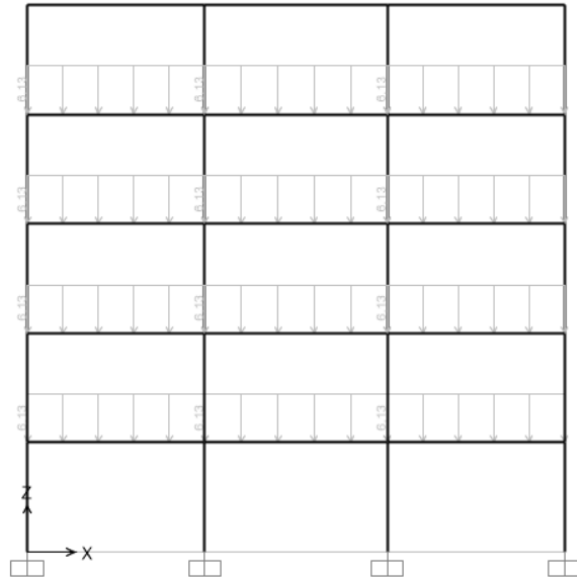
Example of distributed loads representing weight of brick walls acting on beams
